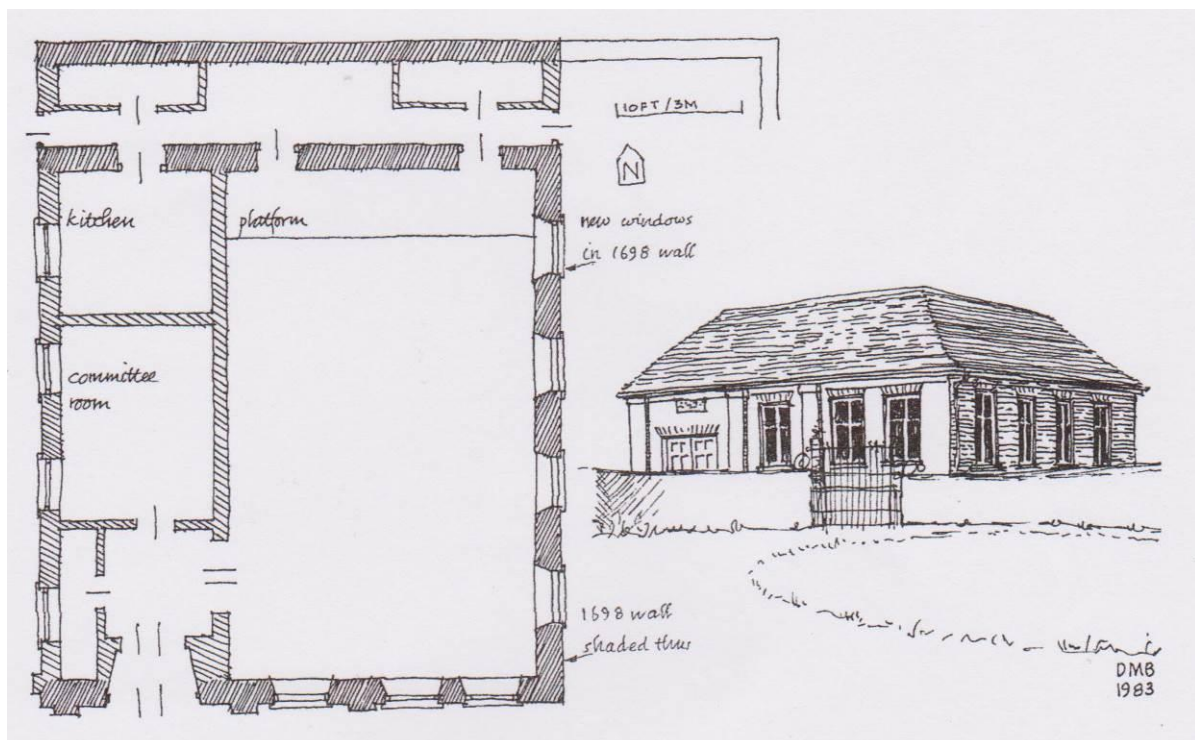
Ground floor plan of the meeting house as rebuilt in 1958
